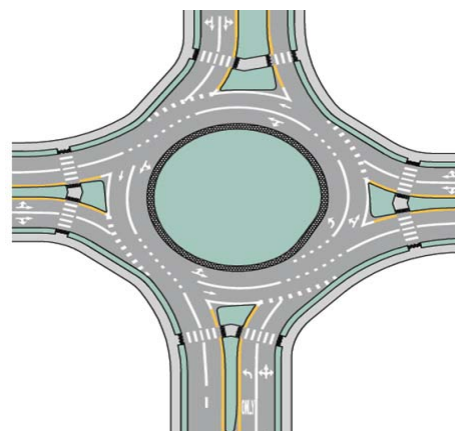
Examples of circulatory roadway pavement markings [FHWA, 2010]
